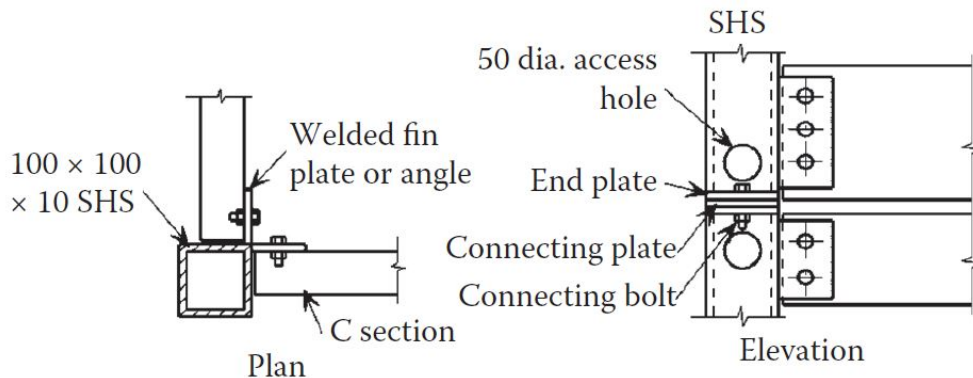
Connection of steel module with SHS and C-sections [30]
